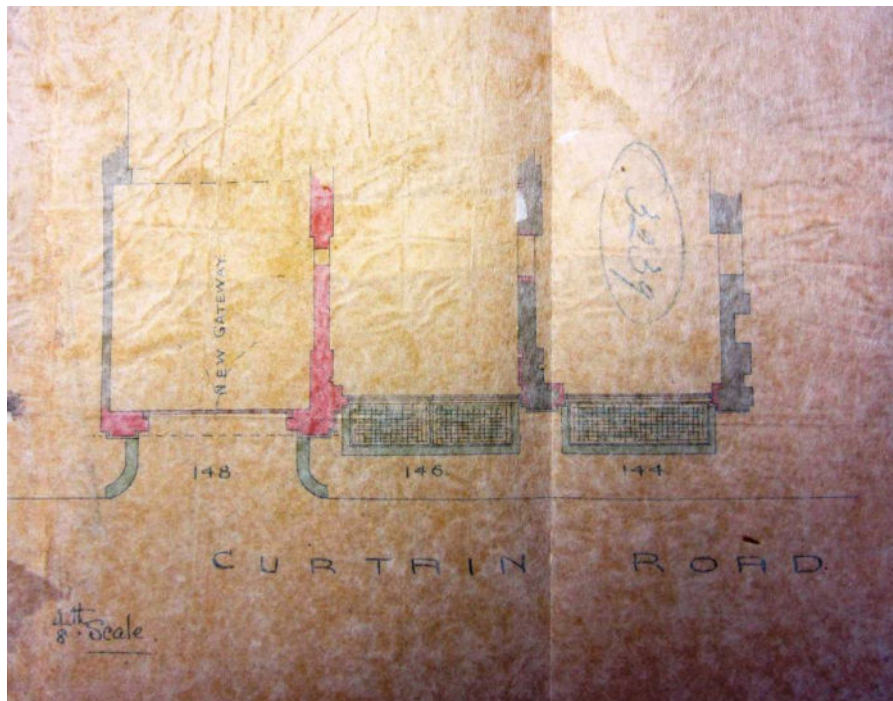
'New building at 146 Curtain Road and new entrance at 148 Curtain Road', 1887 (Hackney Archives, drainage plans 3239)
